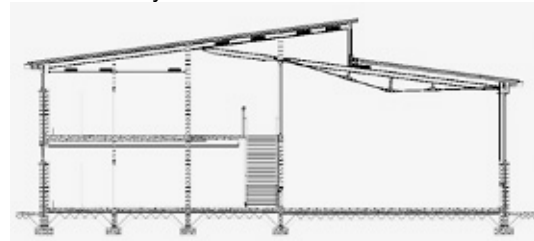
Cross Section thru’ Classrooms, Double height Atrium Stairs & School Hall
